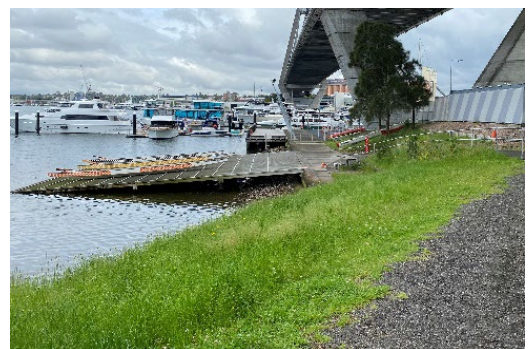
5-19 Bank Street, Pyrmont NSW 2009 showing the dragon boat launching area and Anzac Bridge
